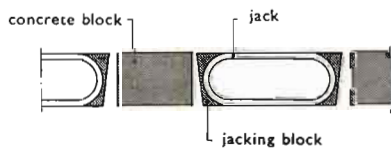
Diagram of the prestressed concrete runway at Maison Blanche (jacks in joints, transverse cables)
